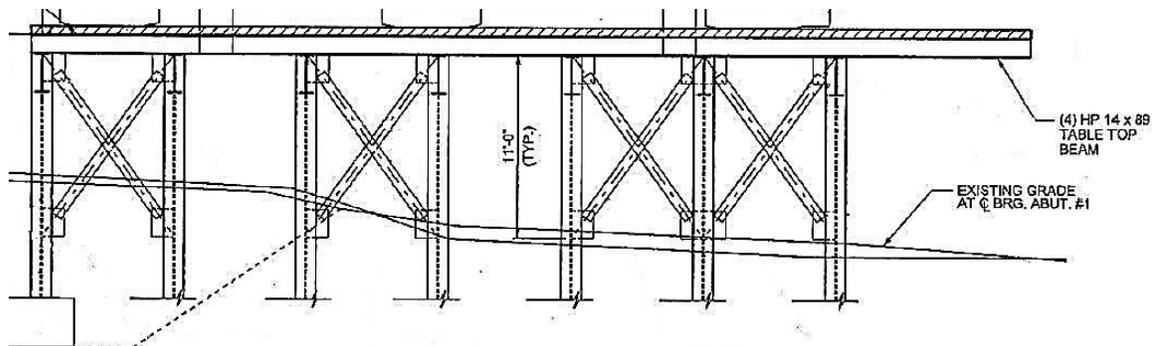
Side view of the I-80 at Wanship temporary substructure for the WB bridge
